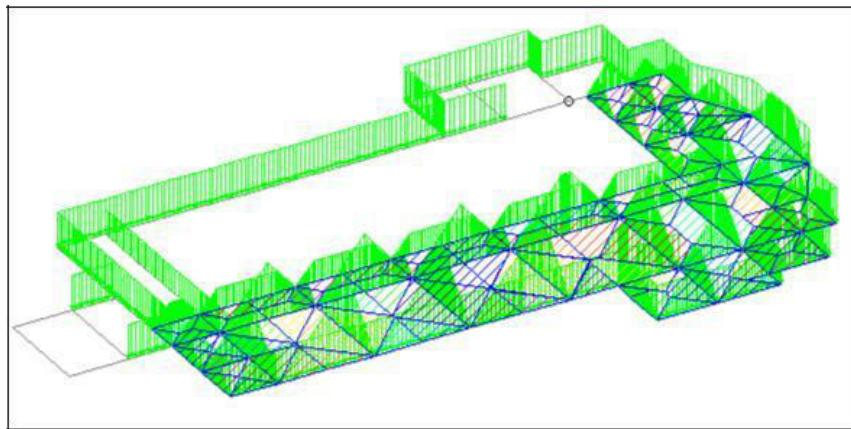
Load distribution on 1st of intensity 18.4 N/mm floor of the structure
